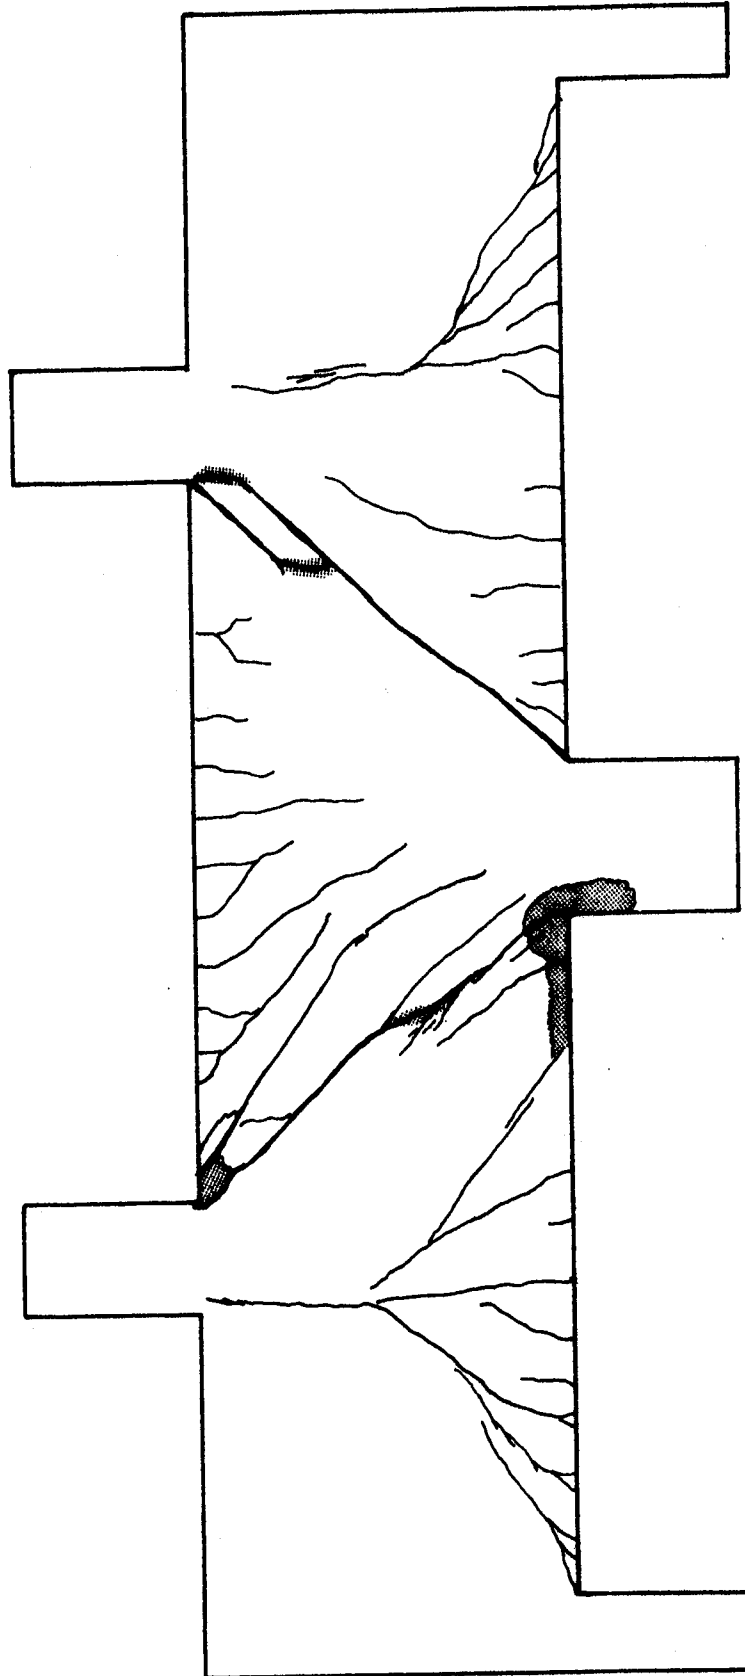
Beam 7/1.0 Crack Pattern - West Face
